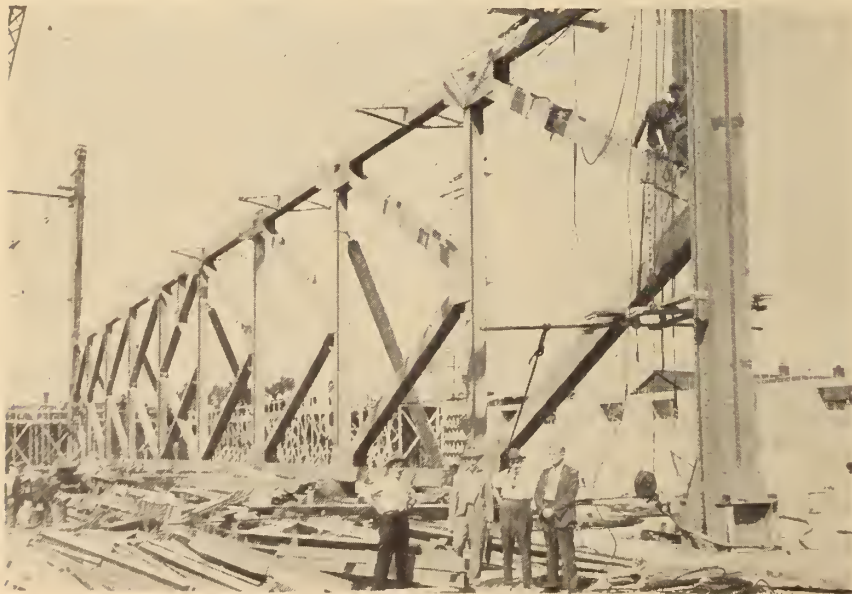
A truss assembled on the ground; note the outrigger and cable stiffeners along the top chord.
